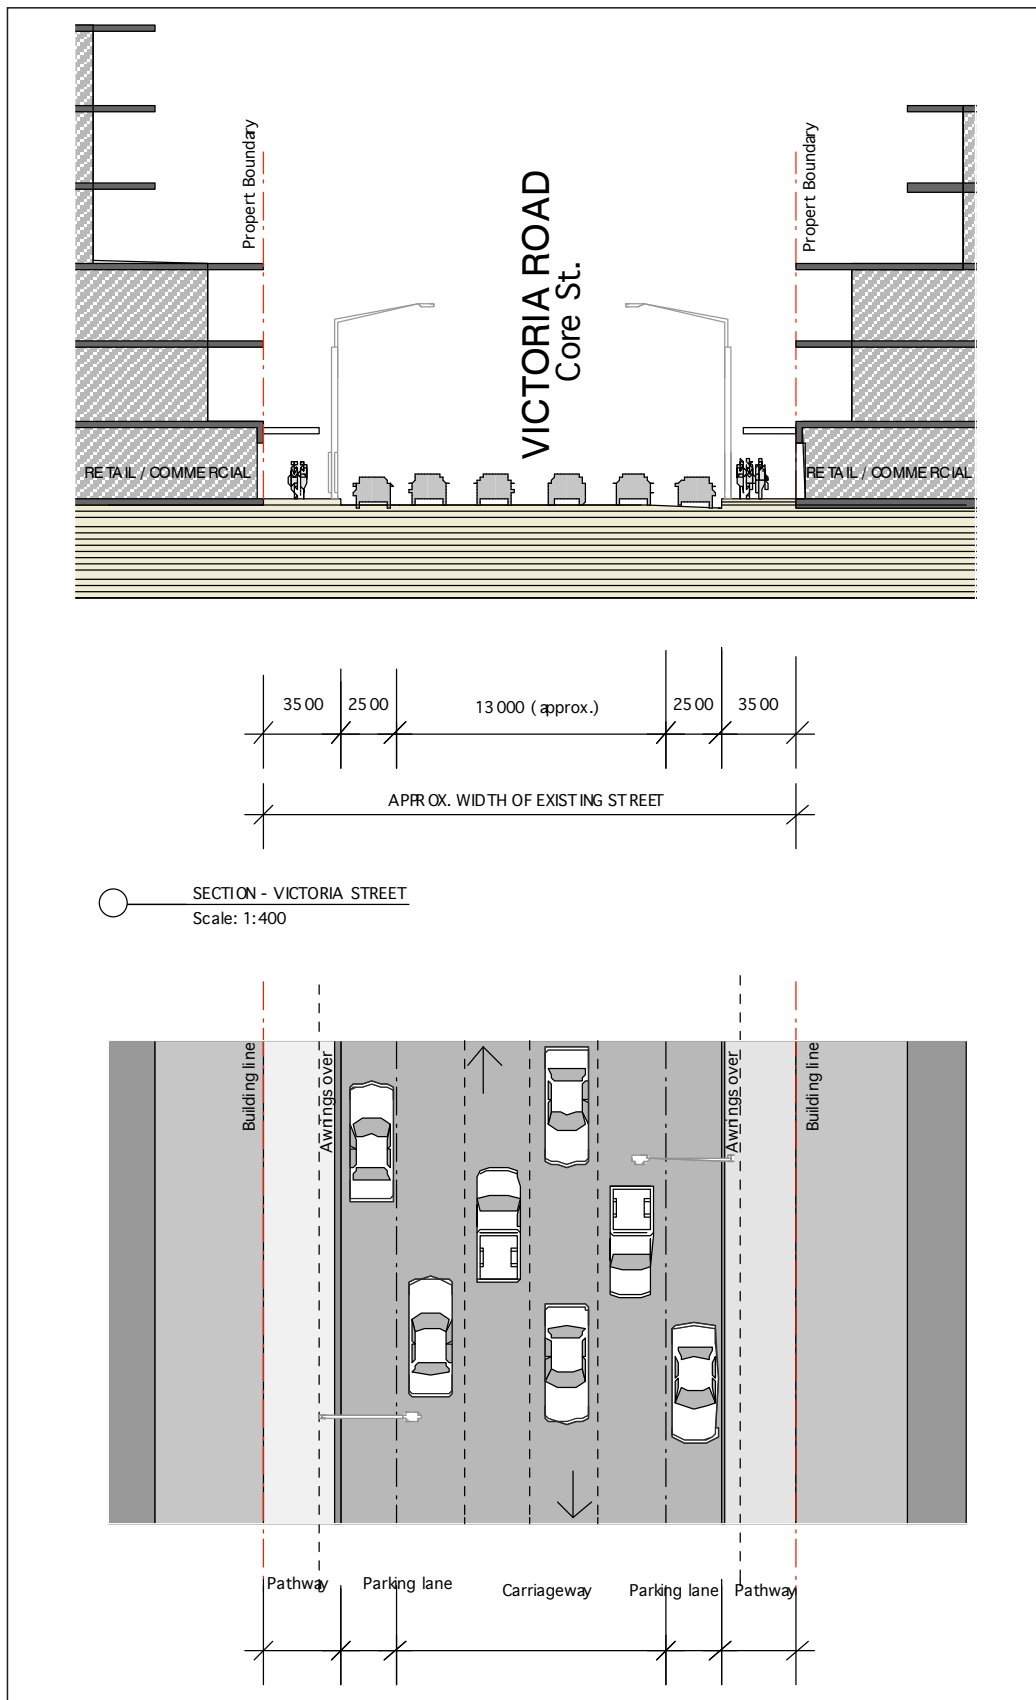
Victoria Road - Town Centre Precinct Section
